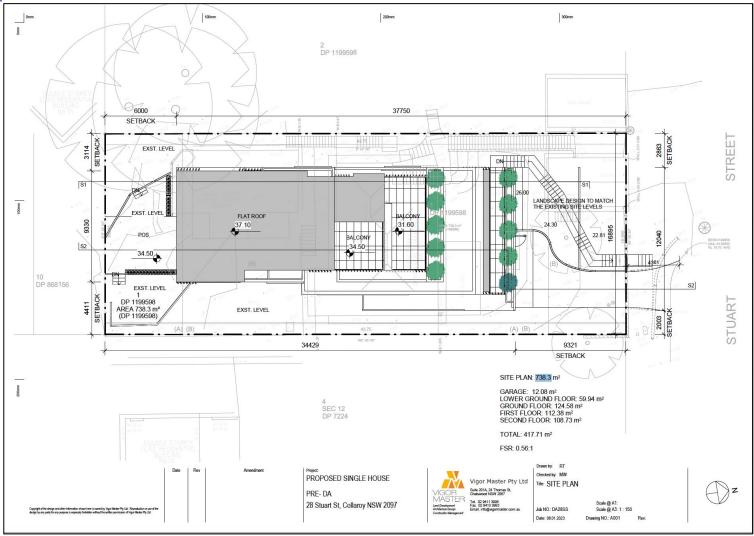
ILLUSTRATES PROPOSED SITE PLAN
